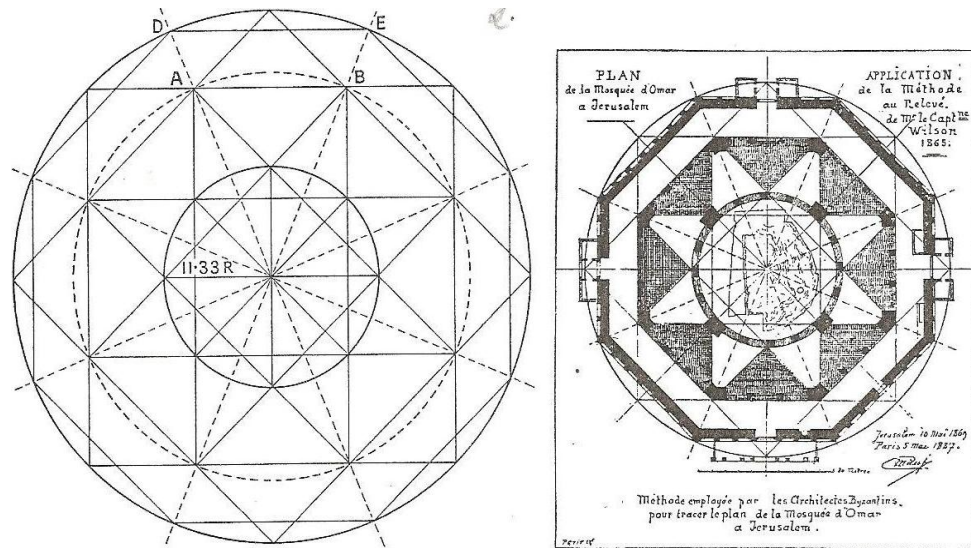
Mauss's Diagram of the plan of the Dome of the Rock (right) and its plan (Creswell 1969)
